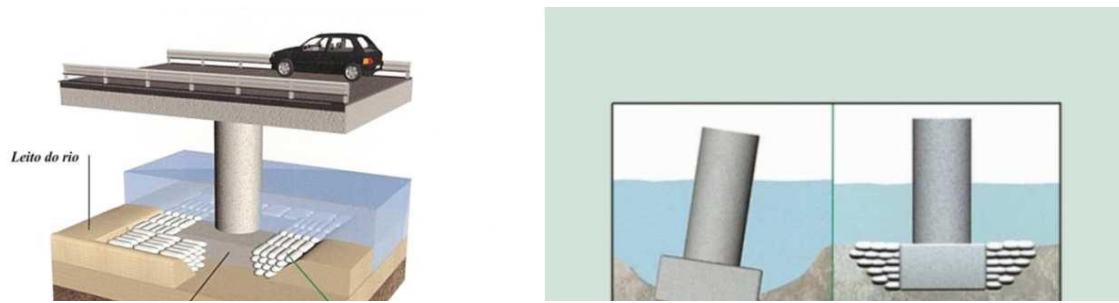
Application of geo-bags filled with sand to protect bridge pillars (NAUE 2005).
